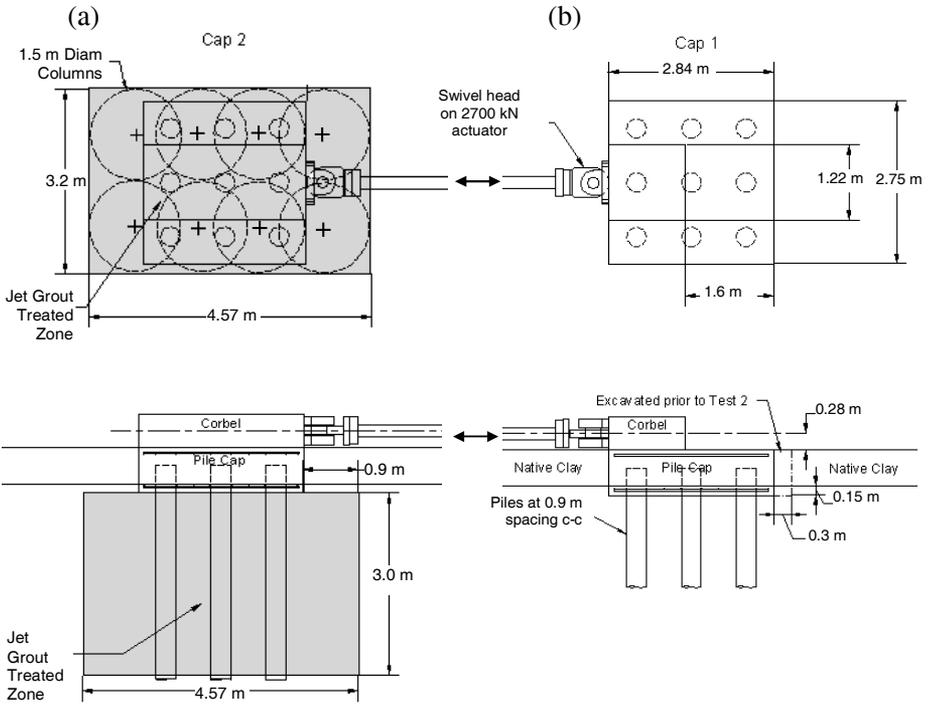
Plan and profile drawings of the pile group (a) after jet grout treatment and (b) in virgin clay before jet grout treatment.
